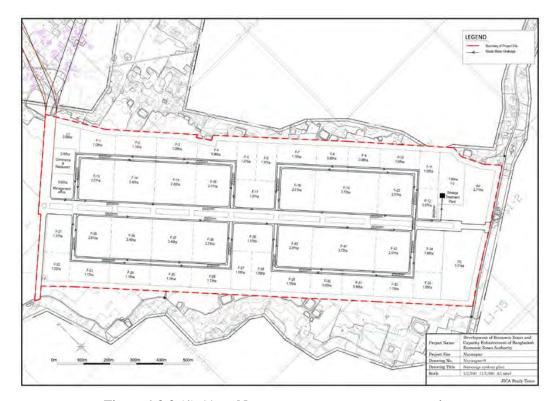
(4)-11 Nayanpur waste water treatment plan
